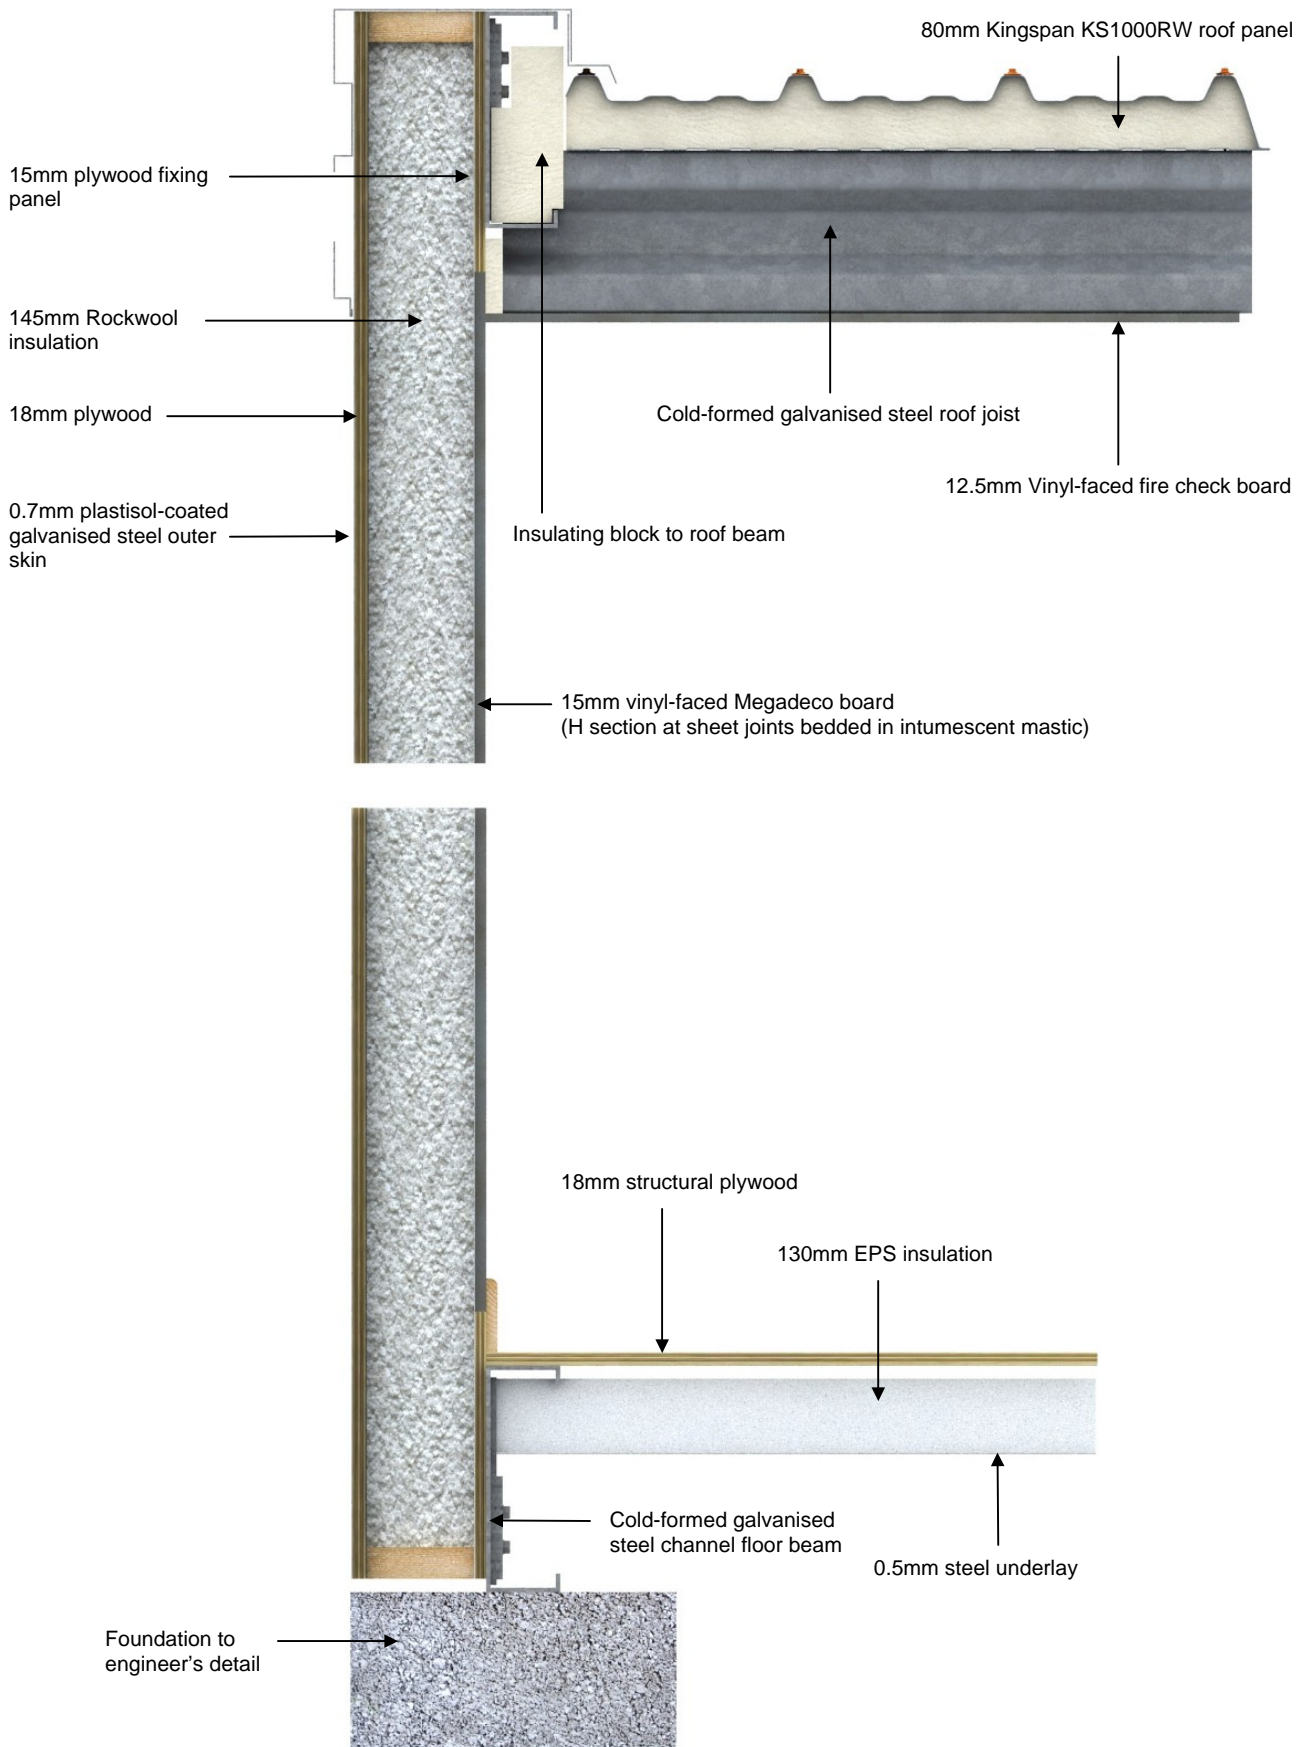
Roof, Wall and Floor Details for 1HRFR Wall Construction
